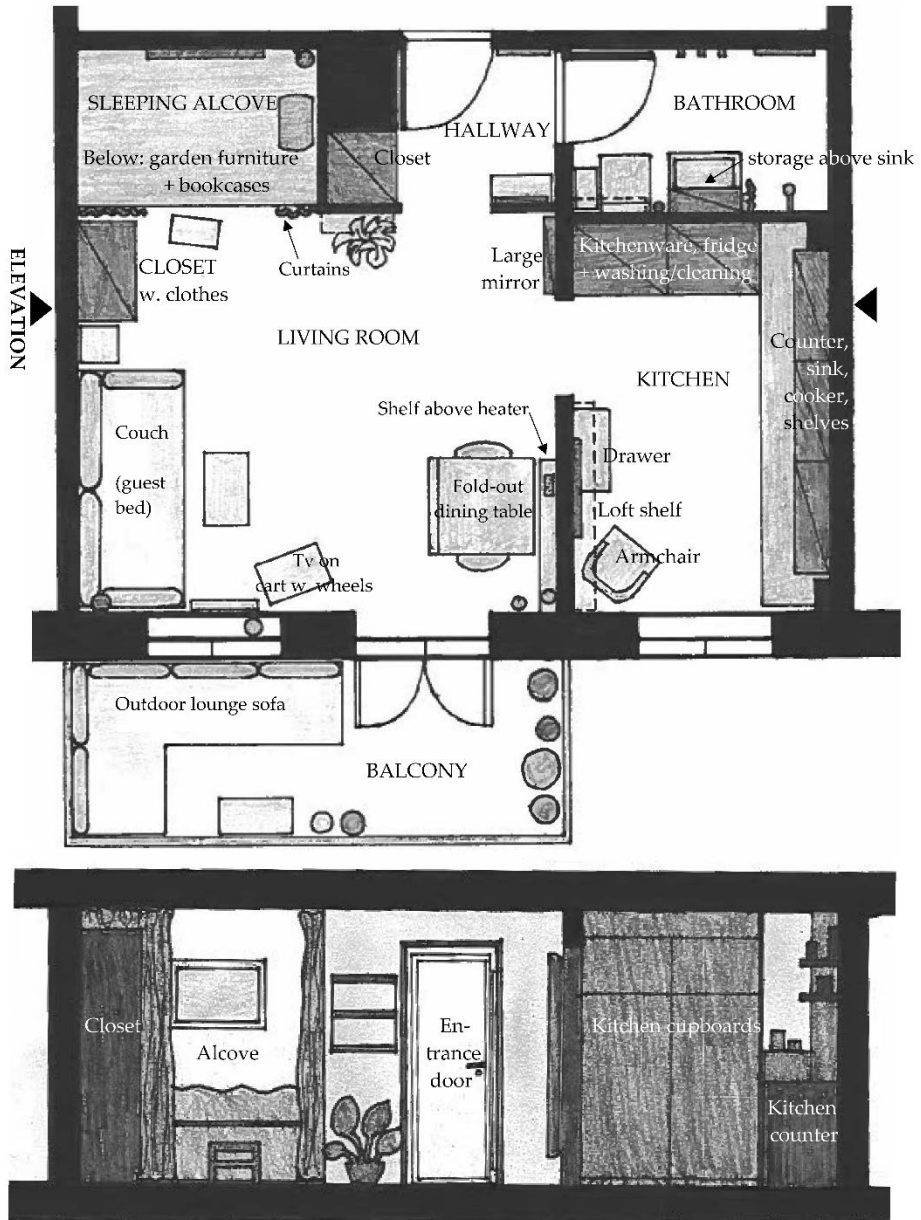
Plan and cross-section of dwelling in Case #5. Illustration by author.
